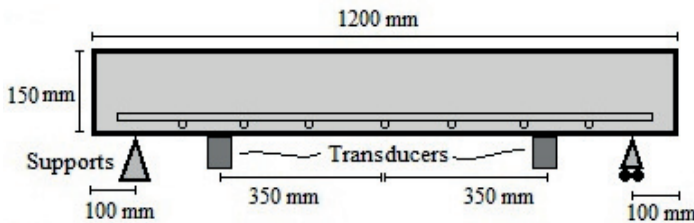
Concrete dimensions, reinforcement layout and transducer locations.
